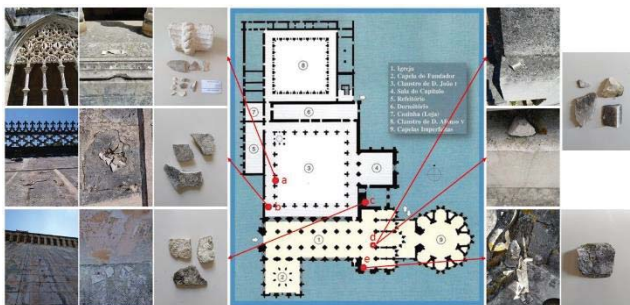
Locations of samples collected from Batalha Monastery a. Royal cloister west gallery 3rd window outside (ground floor level) b. Royal cloister roof top (roof level) c. Church north aisle eaves arch (roof level) d. Church roof railing (roof level) e. Church south carved baluster (roof level)
